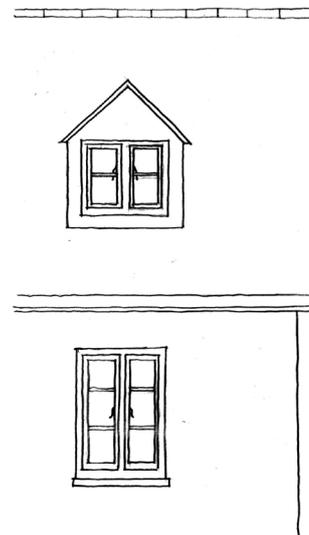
Dormer windows should be smaller than the windows on the main wall of the house.
